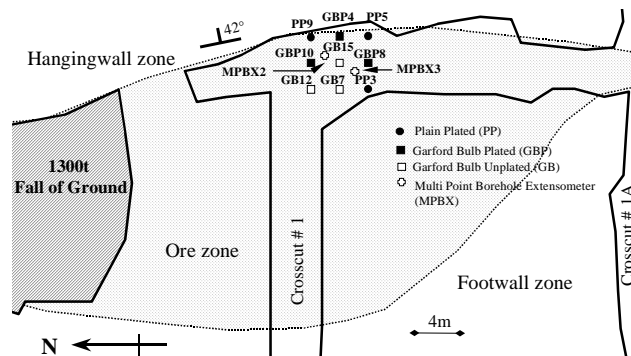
Schematic plan view of the Callinan test stope, East Zone, 1050m level, showing the geotechnical zones and the SMART instrumentation locations.
